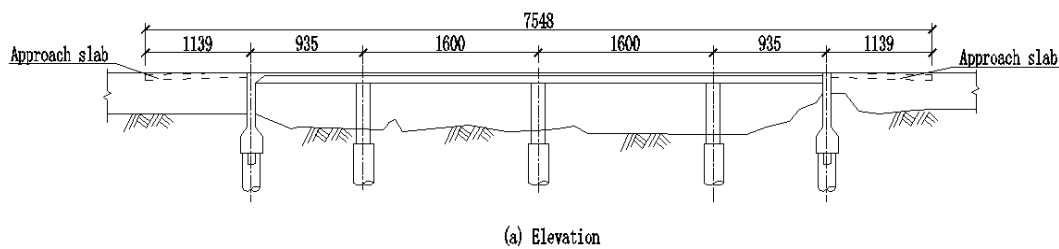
East end elevation of the Cheng Nan Road Viaduct
